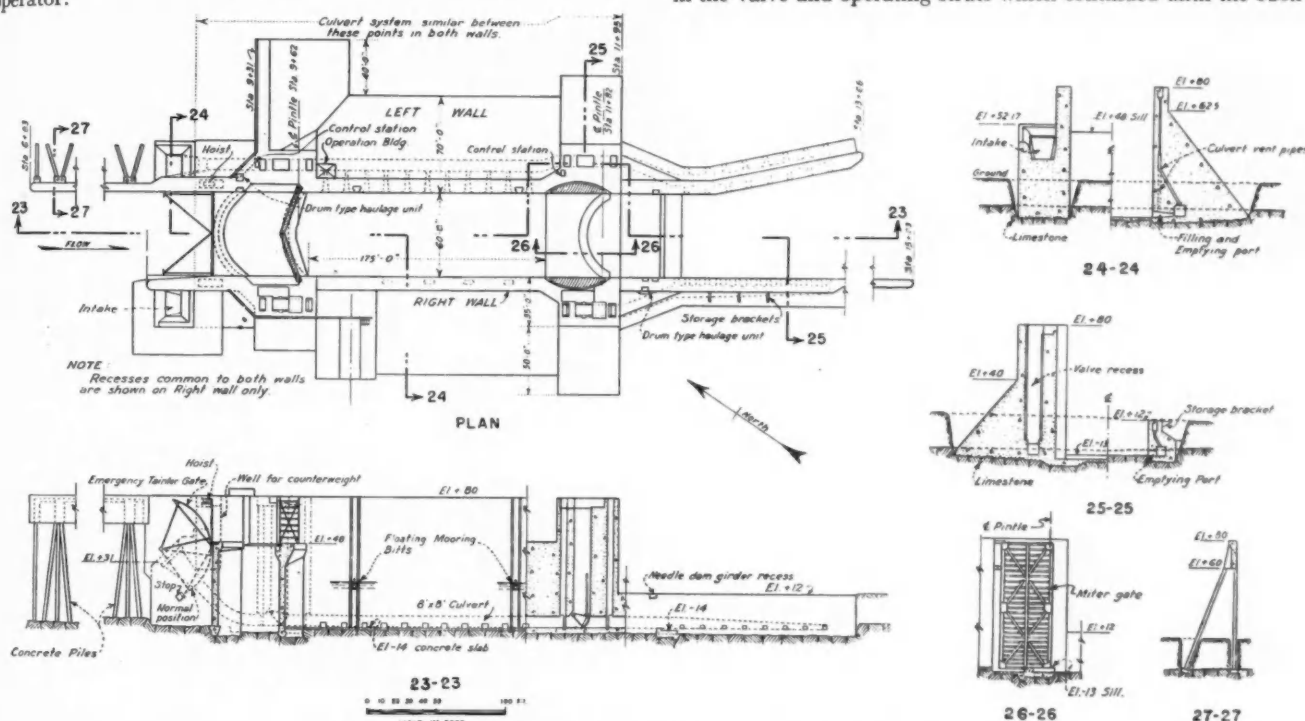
Pinopolis Lock, Cooper River, South Carolina.
